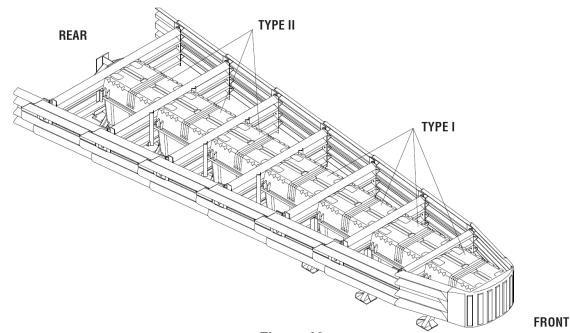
Typical Cartridge Layout (Six - Bay System Shown)
